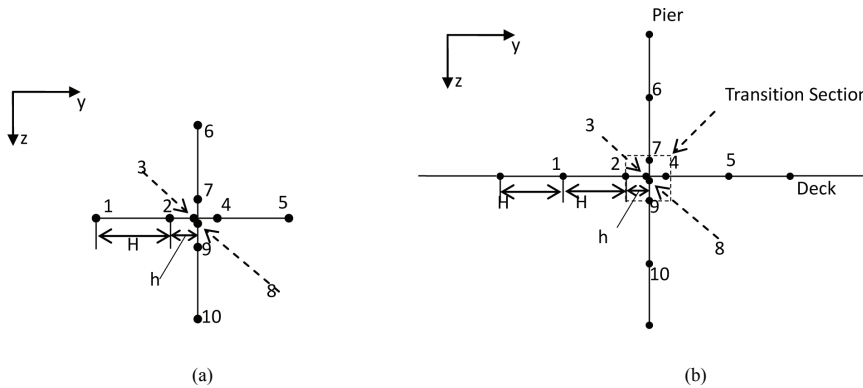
(a) Typical transition section; (b) Transition section between Deck and Pier
